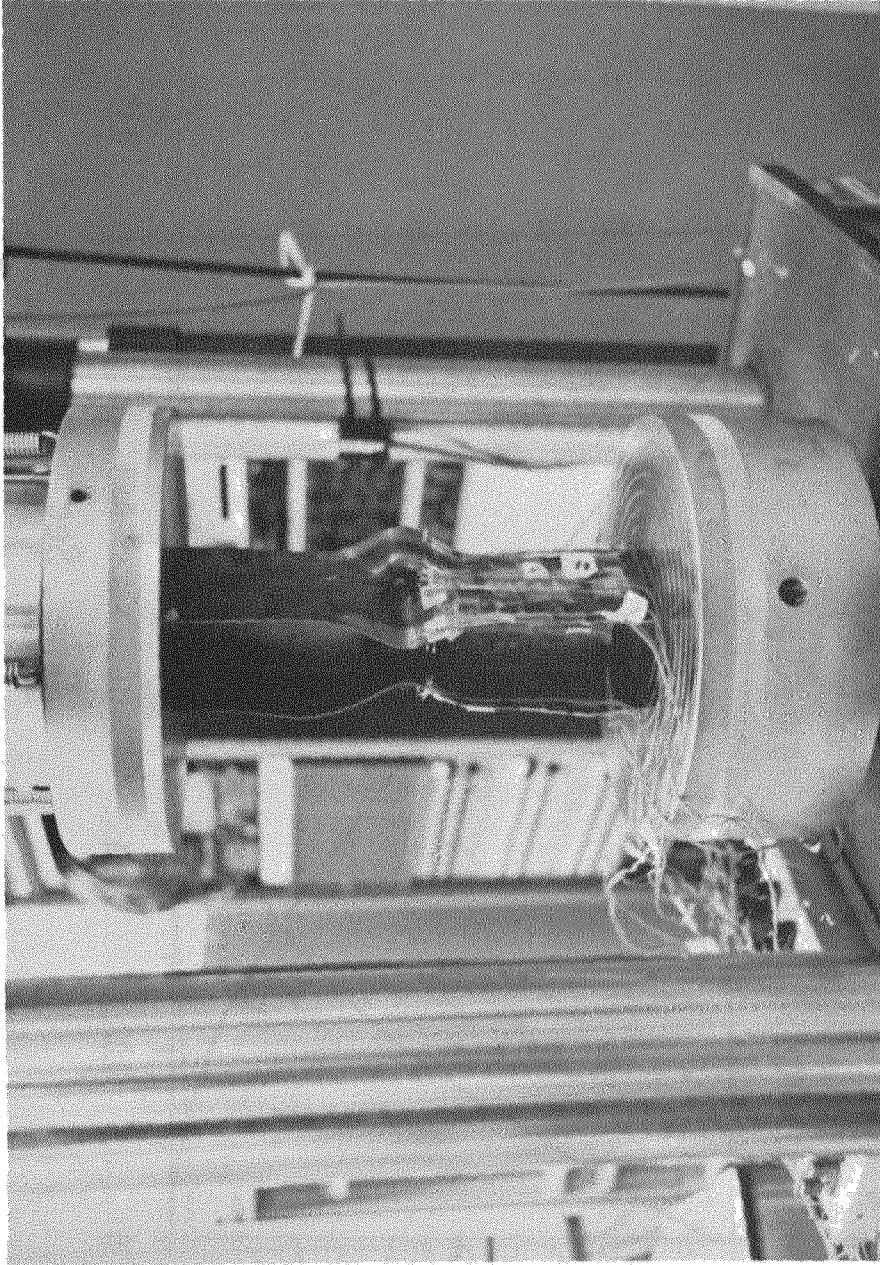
Typical Failure of Stub Columns with Unstiffened Flanges
